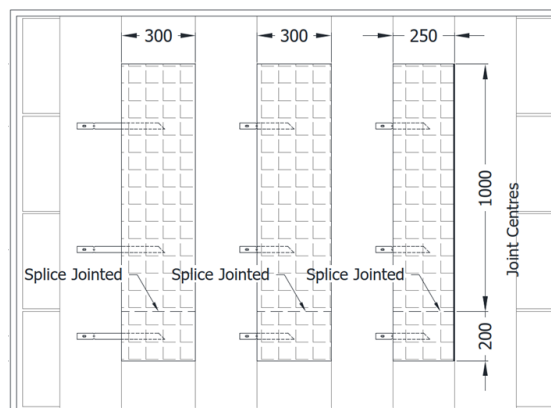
General plan view of the tested systems as provided by the report applicant (as tested)
